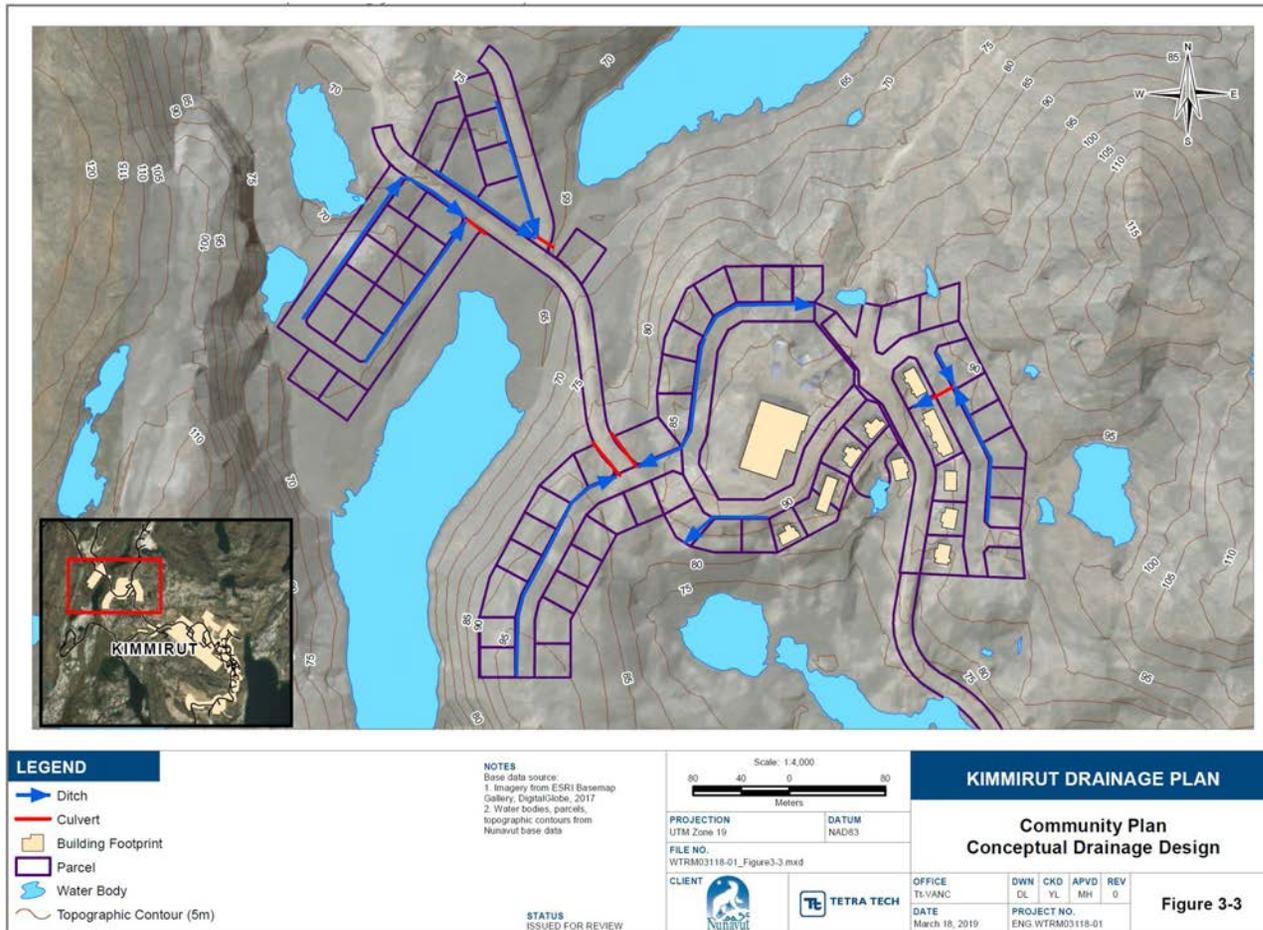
A conceptual design of a drainage master plan for a subdivision in Kimmirut
